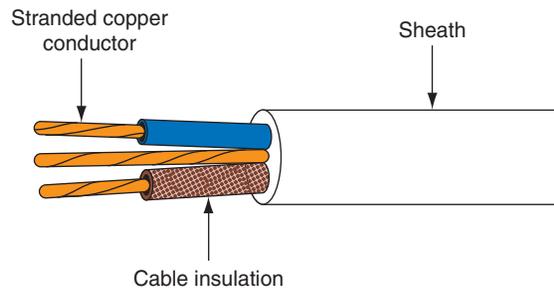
A twin and earth PVC insulated and sheathed cable.
